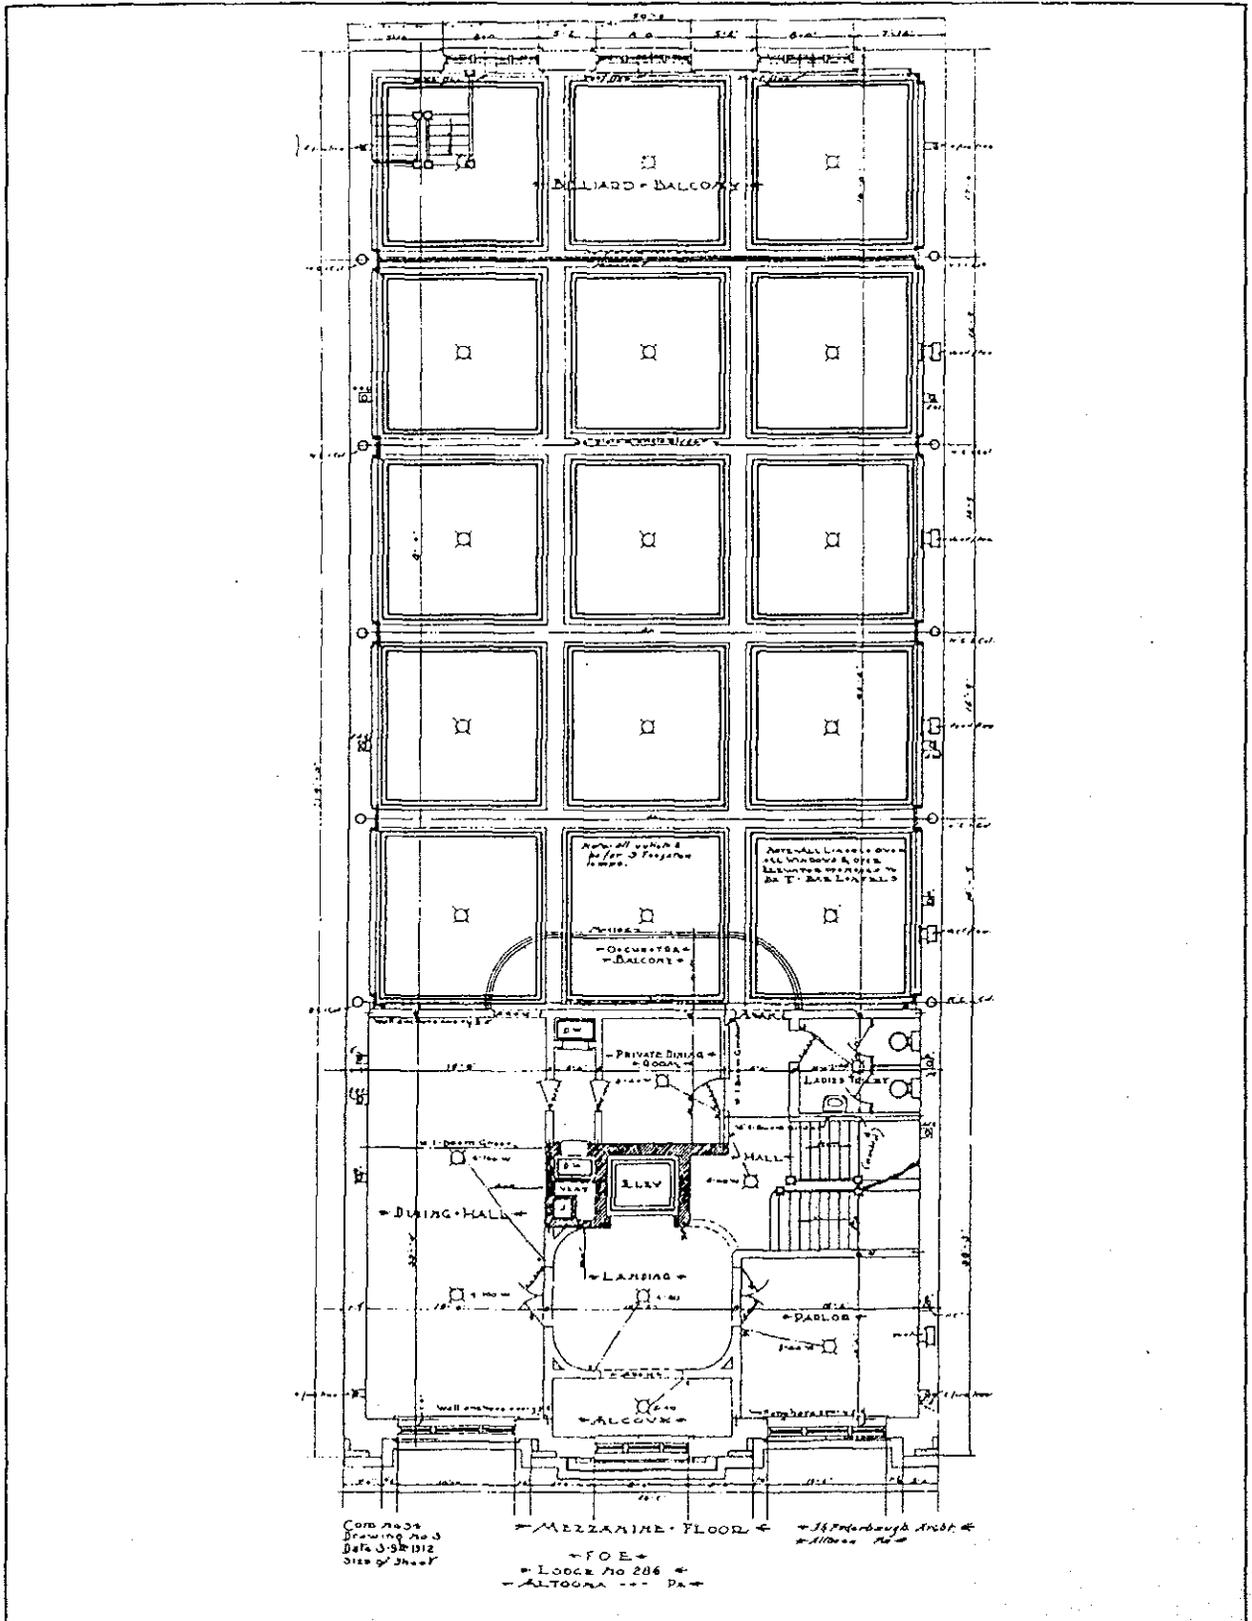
Mezzanine-floor plan, March 9, 1912.
